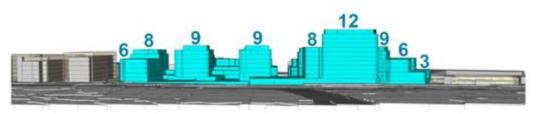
Eastern View: Recommended building envelopes with height in storeys (Source: Studio GL)
